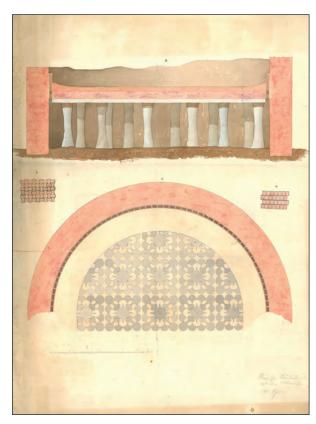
Layout and section of room No 1's excavated part during the 1856 excavation (©Bundesdenkmalamt Wien, Sammlung von historischen Ansichten (Abteilung für Inventarisation und Denkmalforschung, Fotoarchiv)
